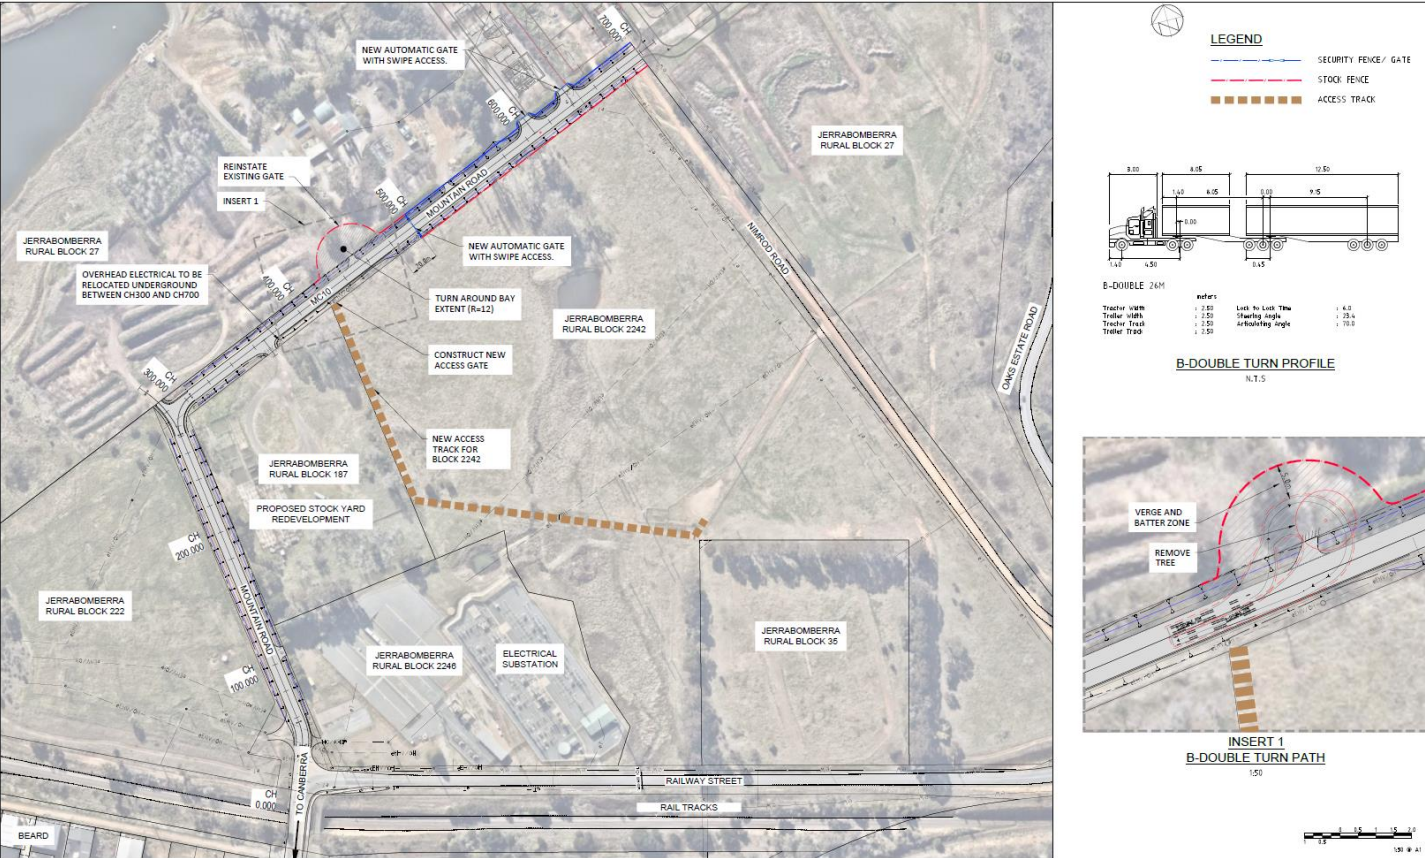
Planned upgrade to the Mountain Road access road to the QSTP
